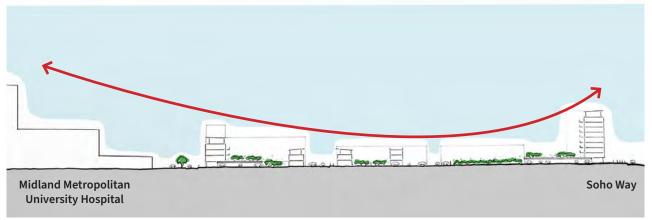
Illustrative section showing massing and landmark building onto Soho Way
